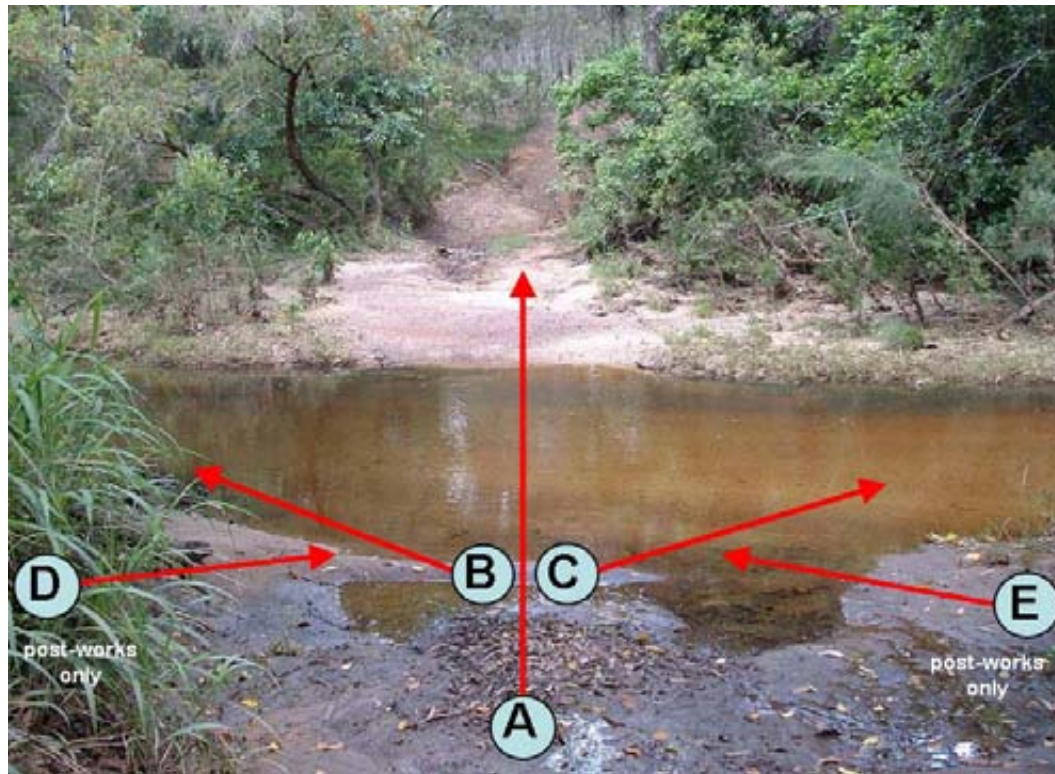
The location and direction of pre- and post-works photos at a site of proposed barrier works
